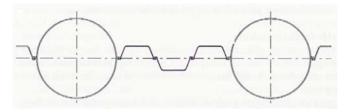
Profile with combined wall and triple U-shaped infill profile
